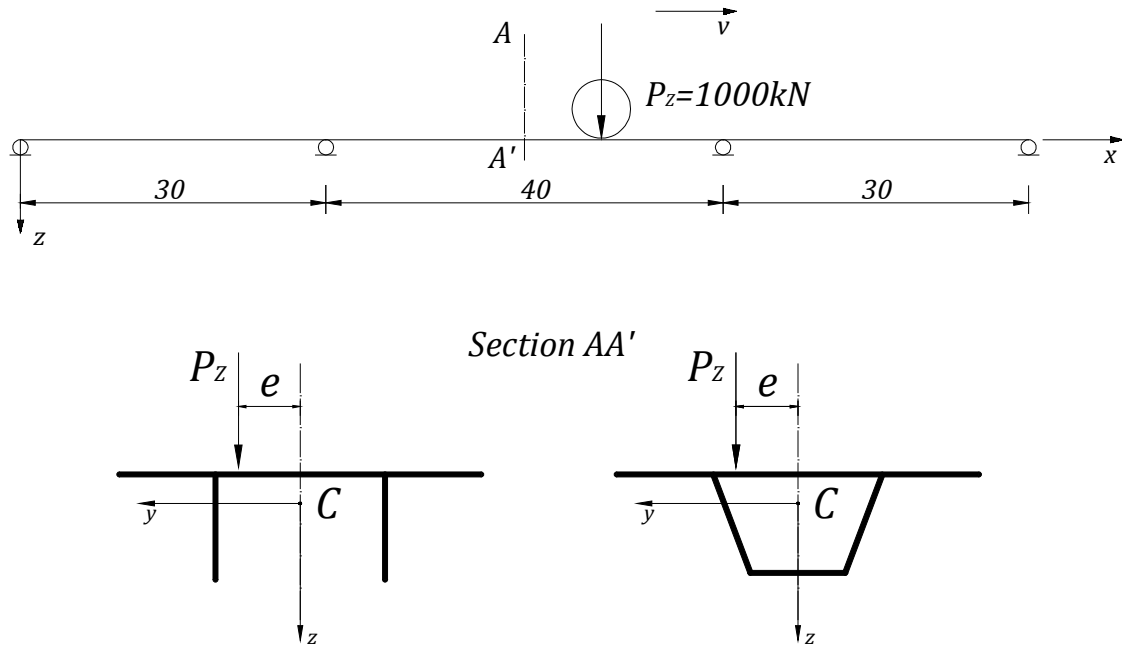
Longitudinal beam-like model (a) and layout of the cross-section analyzed (b).
